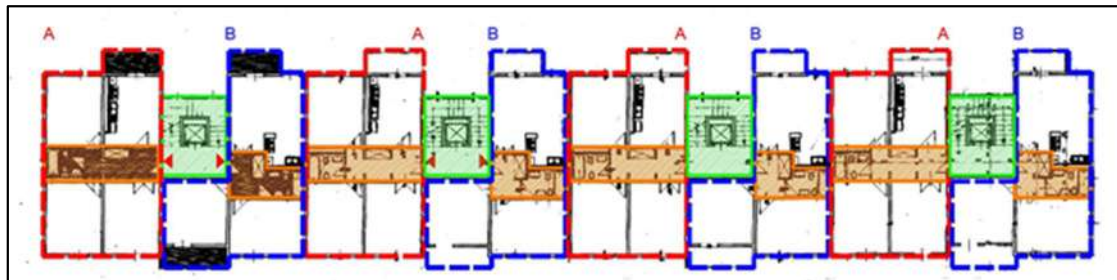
Typical Floor Plan-Building A: Service areas are highlighted in orange, in red and blue flat TYPE A and flat TYPE B respectively and in green the stairwells.
